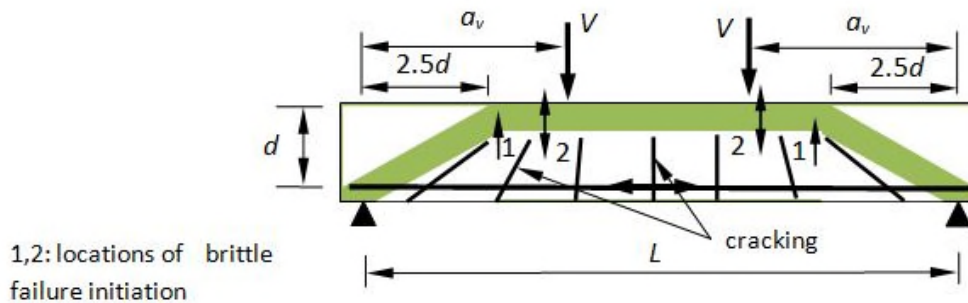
CFP model for a simply-supported RC beam with longitudinal steel bonded to concrete under two-point loading
